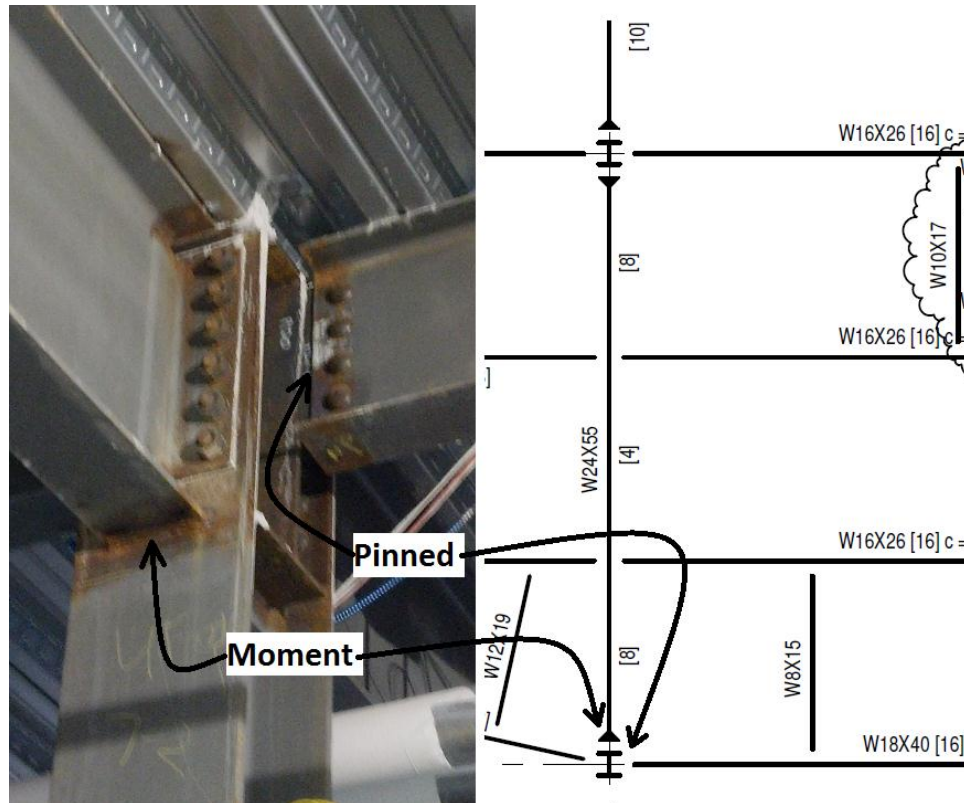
Steel Connections- In Building vs. On Drawing (S1.04)
